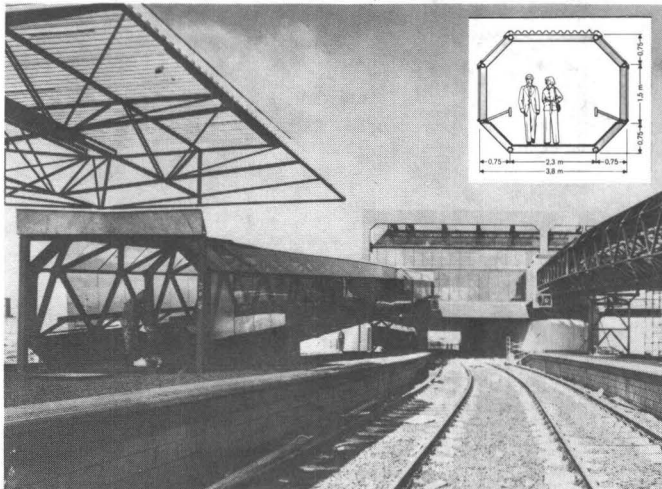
Footbridge ramps with surrounding framework, Belfast
